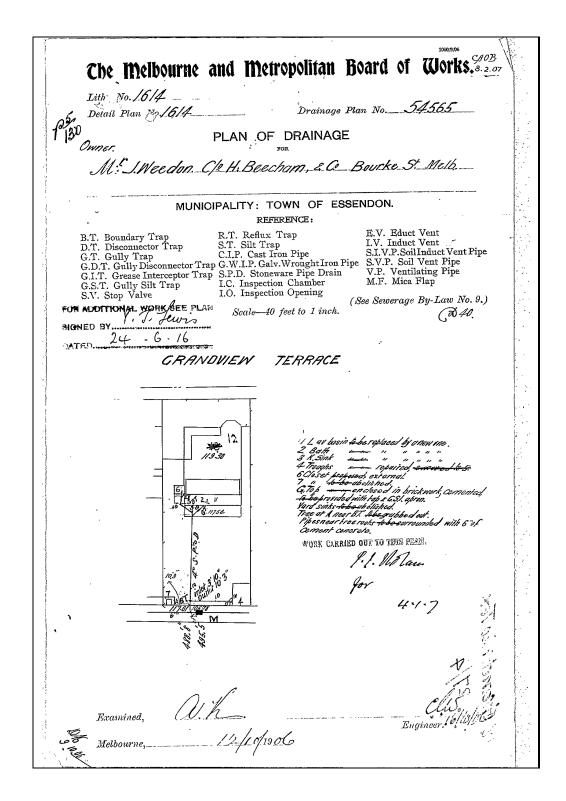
MMBW Property Drainage Plan No.54565 (dated 1906) showing the footprint of the dwelling at 12 Grandview Street at that time. Source: Casey Inspection Services.
